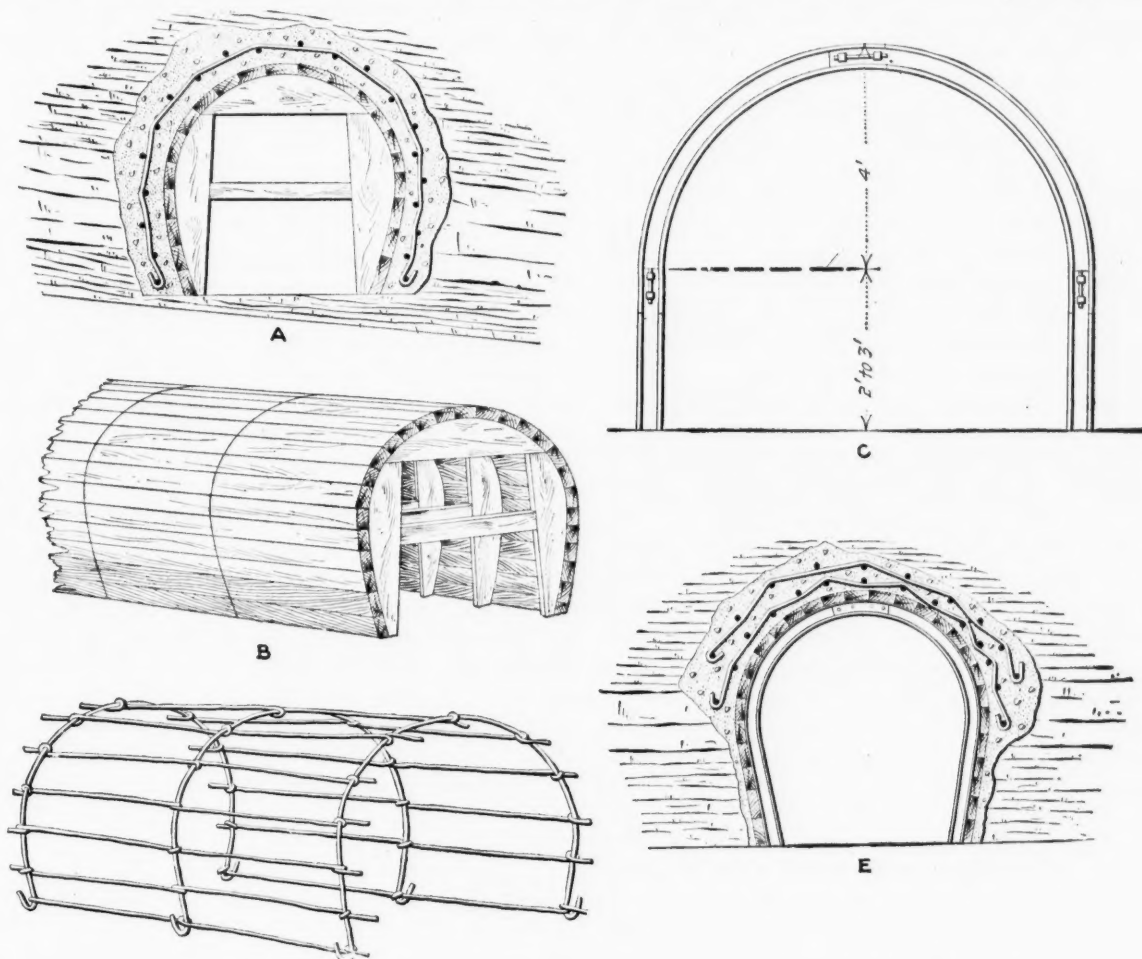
ARRANGEMENT OF REINFORCEMENT AND ARCH CENTERS FOR TUNNEL LININGS
